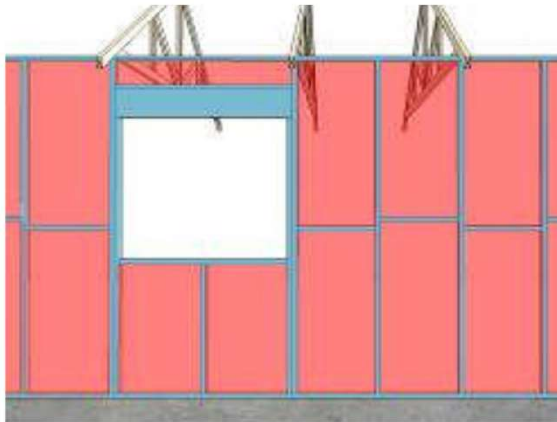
Example of Aligned Wall and Roof Structure Requiring a Single Top Plate
